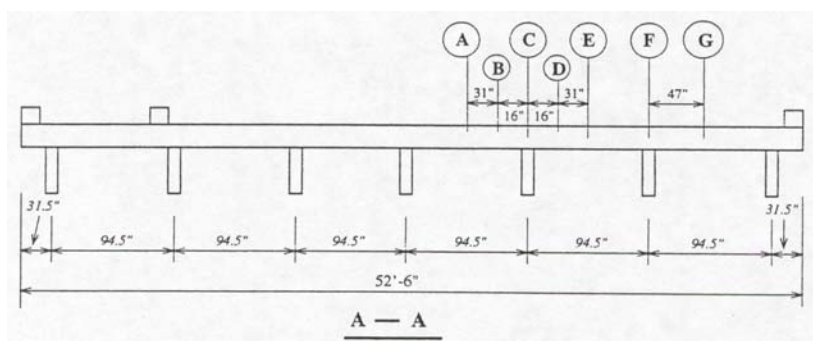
Plan View of Transverse Gage Lines (from Cao et al., 1994)
